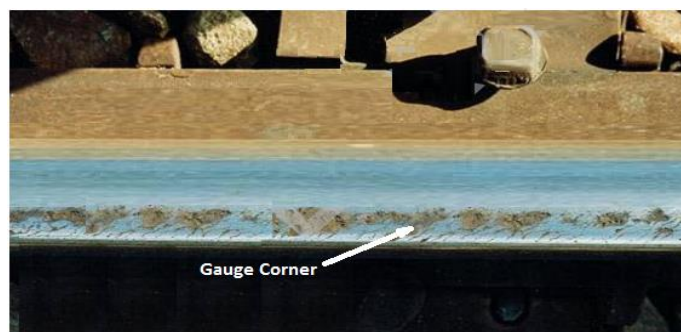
Severe stage of gauge corner checking cracks and spalls (U.S. Dept. of Transportation, 1984)
